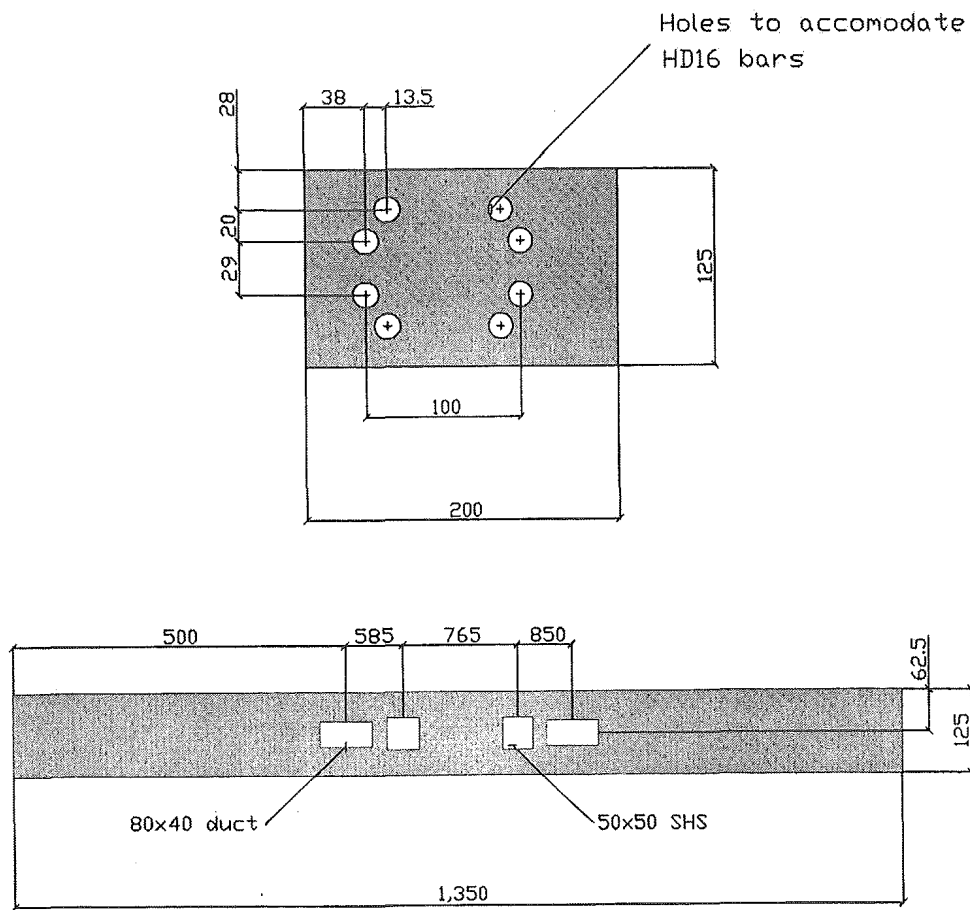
Bottom plate detail for the wall panel of Unit 2.
